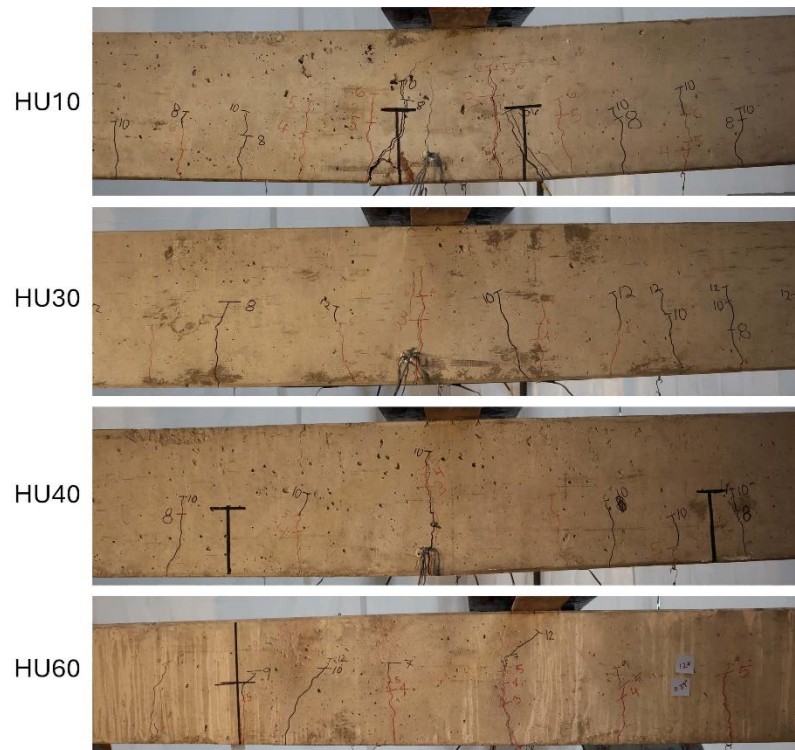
Cracking condition of specimens at 0.005 steel strain
